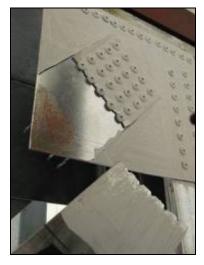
Net section fracture of braces of specimen 45A-M at 7.6% drift
